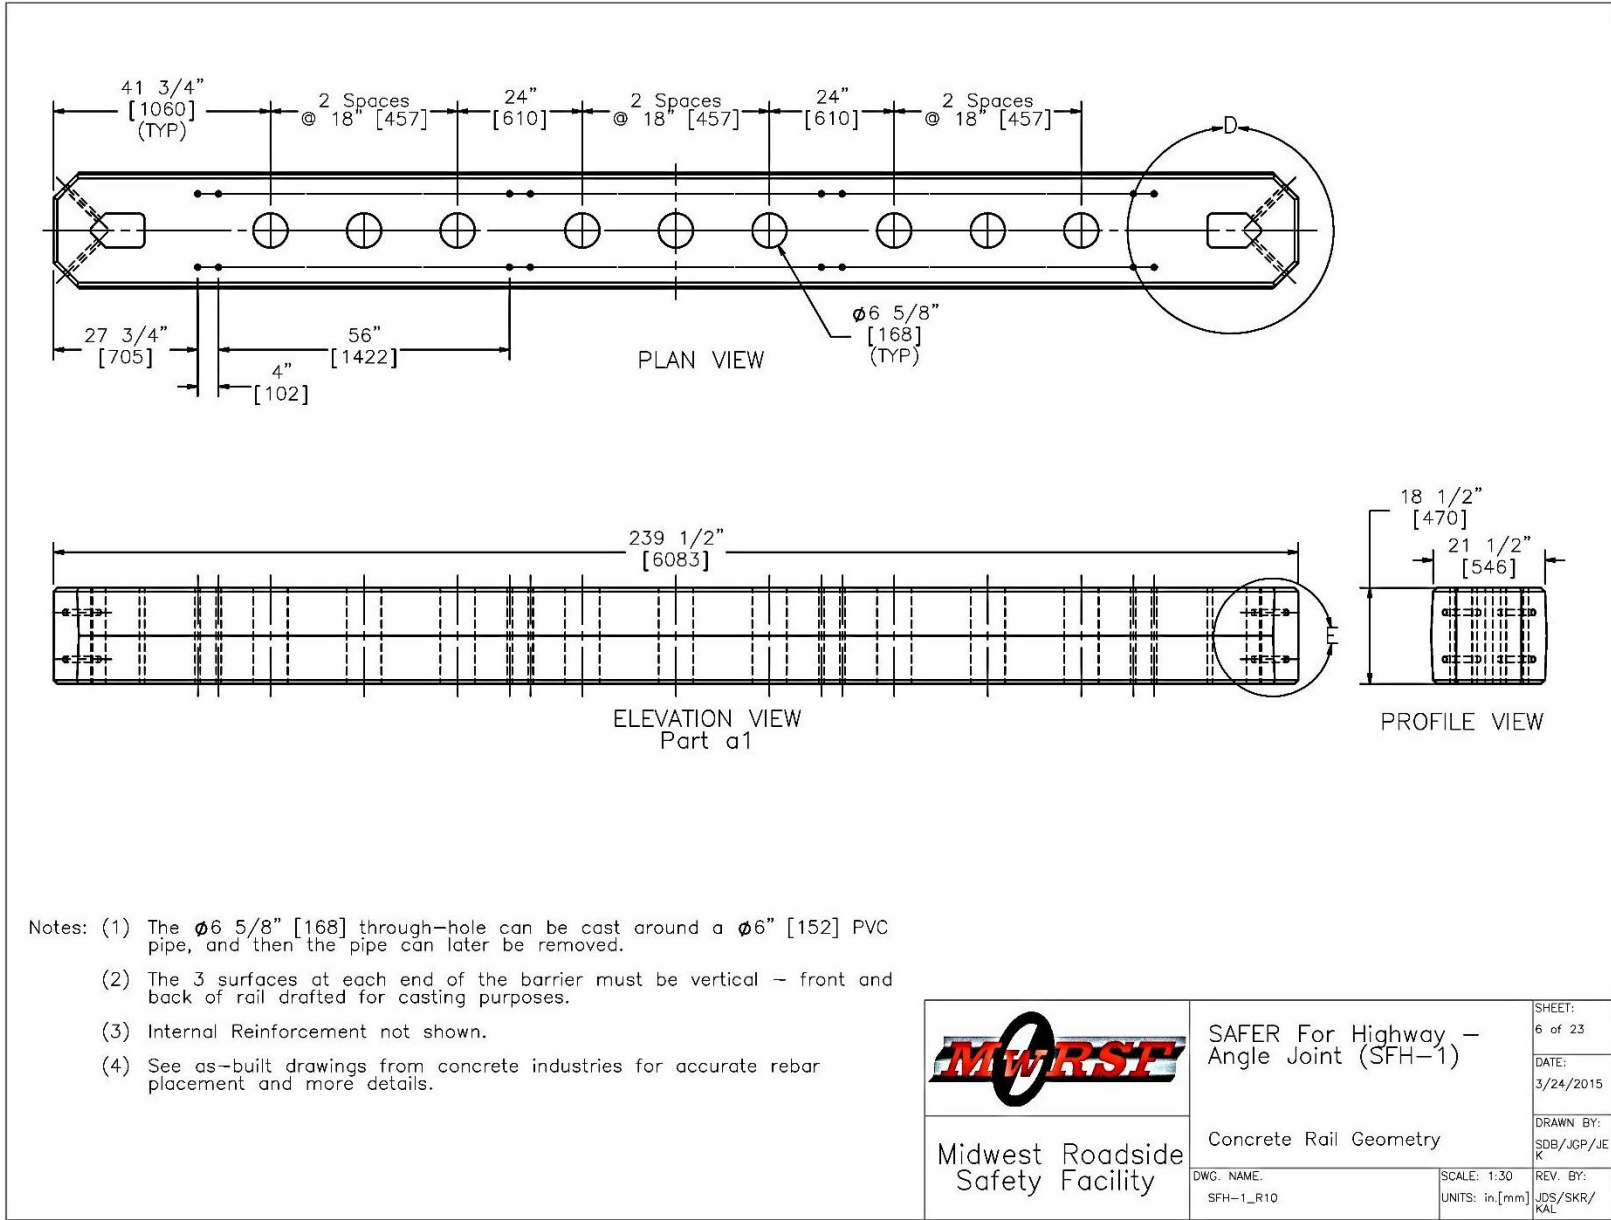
Concrete Beam Geometry, Test Nos. SFH-1 and SFH-2
